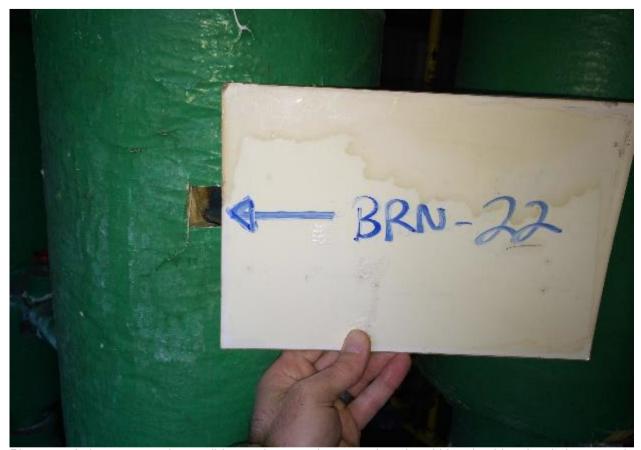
Laboratory analyses did not detect asbestos minerals within plumbing insulation sample BRN-22 collected from the North Administrative Building outdoor mechanical room.
